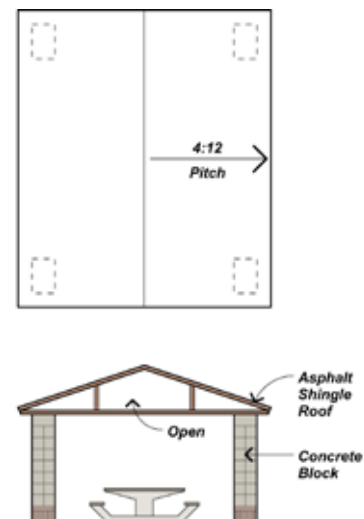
Typical elevation for replacement picnic shelters.
